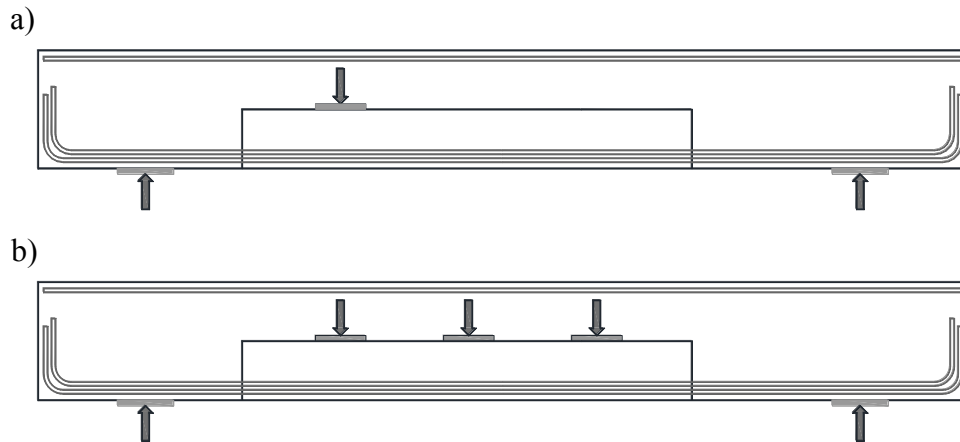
(a) One point load specimen, (b) three point load specimen
